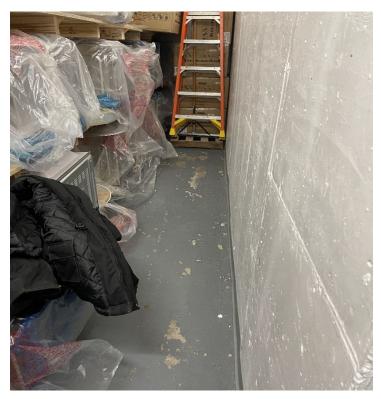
Photo of the concrete slab in a storage room of the Site's cellar.
